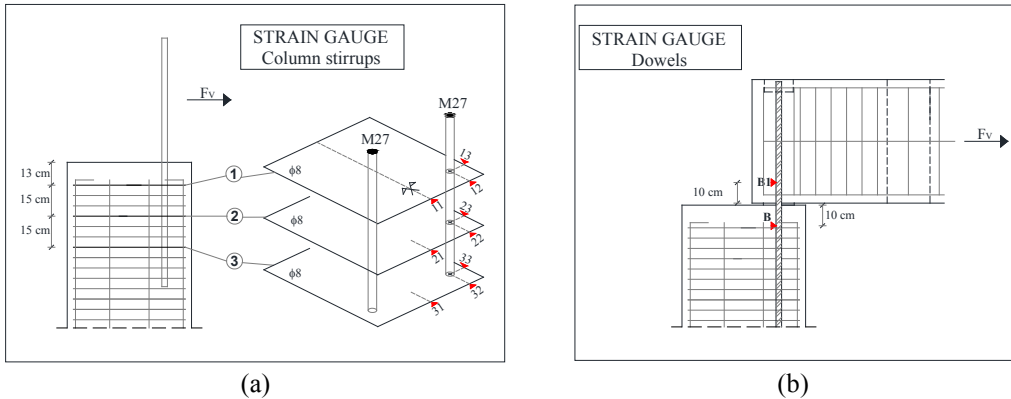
Layout of stain gauges placed on steel elements: (a) column stirrups and (b) left dowel bar
